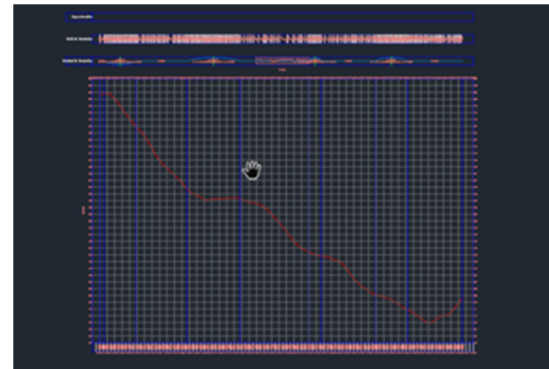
Existing profile of the alignment plan (Source: Autodesk Civil 3D)
